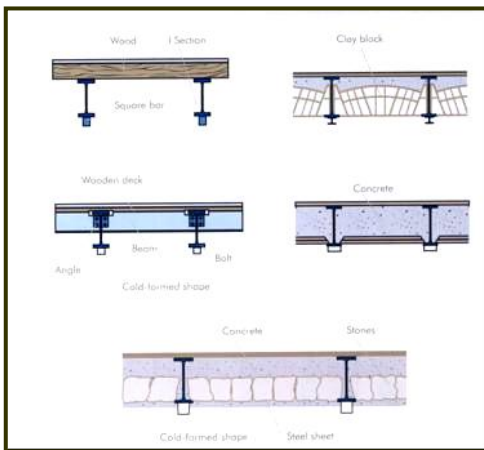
Consolidation systems of floor steel beams, by increasing the section modulus with additional steel elements, which can be welded or bolted to the bottom flange of the existing beam.
